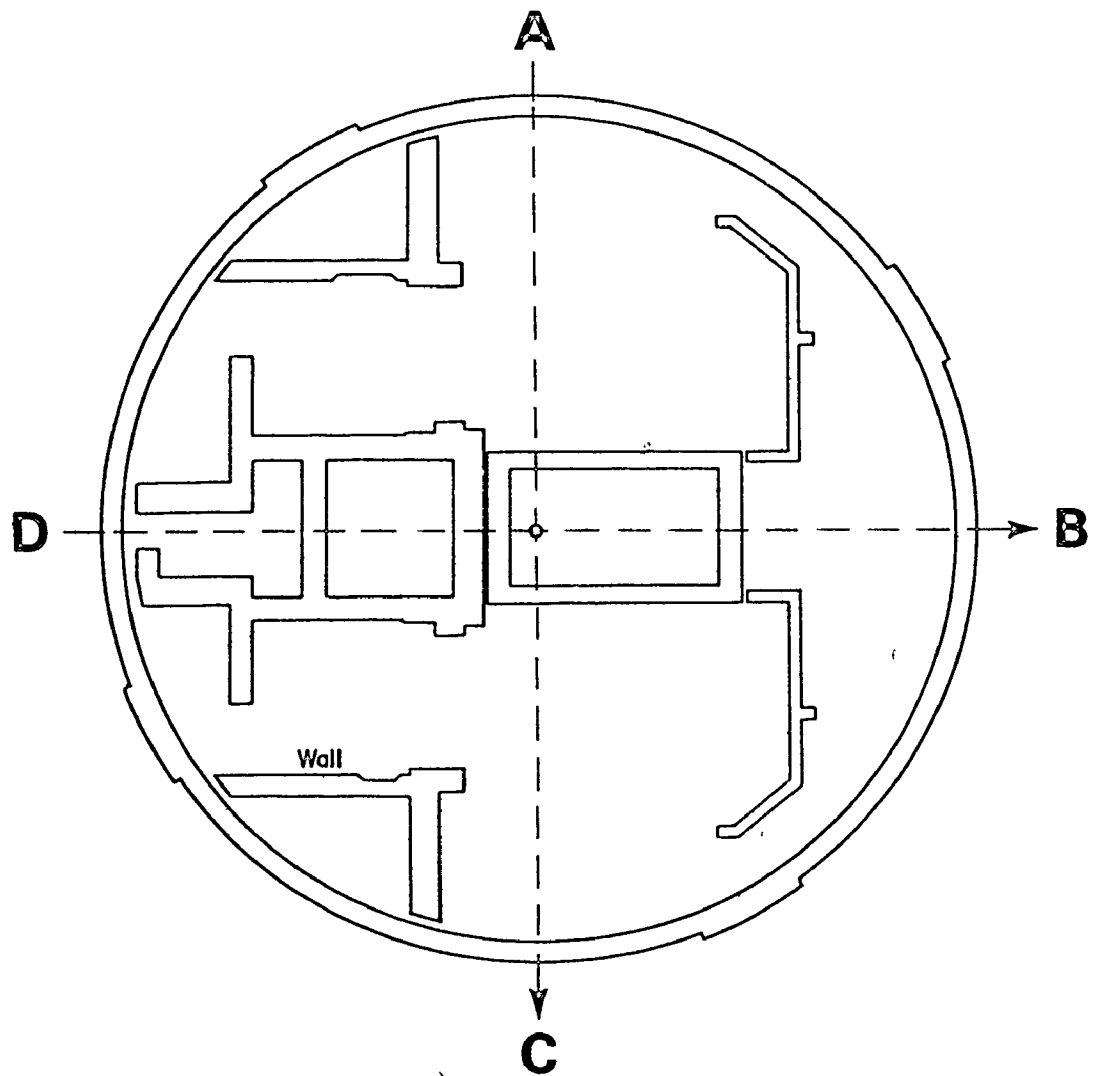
TYPICAL STRUCTURAL PLAN OF CANDU REACTOR BUILDING
